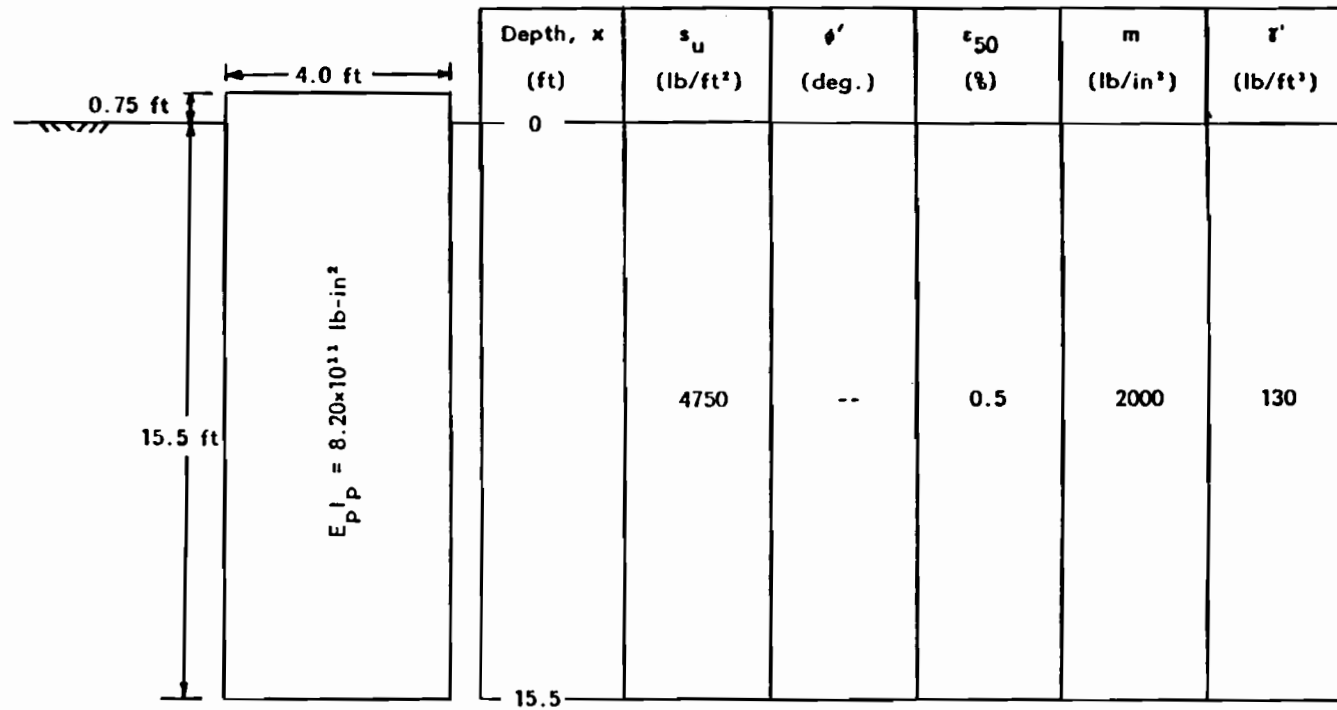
Soil and Drilled Shaft Data Used for COM624 Input, Shaft No. 21.
